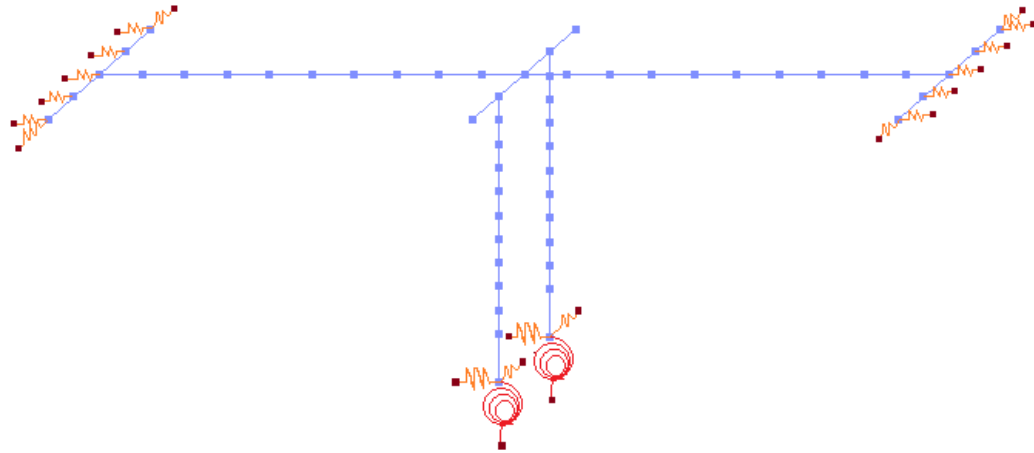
Typical layout of two span bridge modeled in OpenSees.
